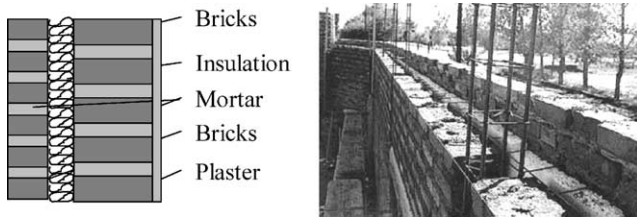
The insulated external walls: section (left) and picture during their construction (right).
